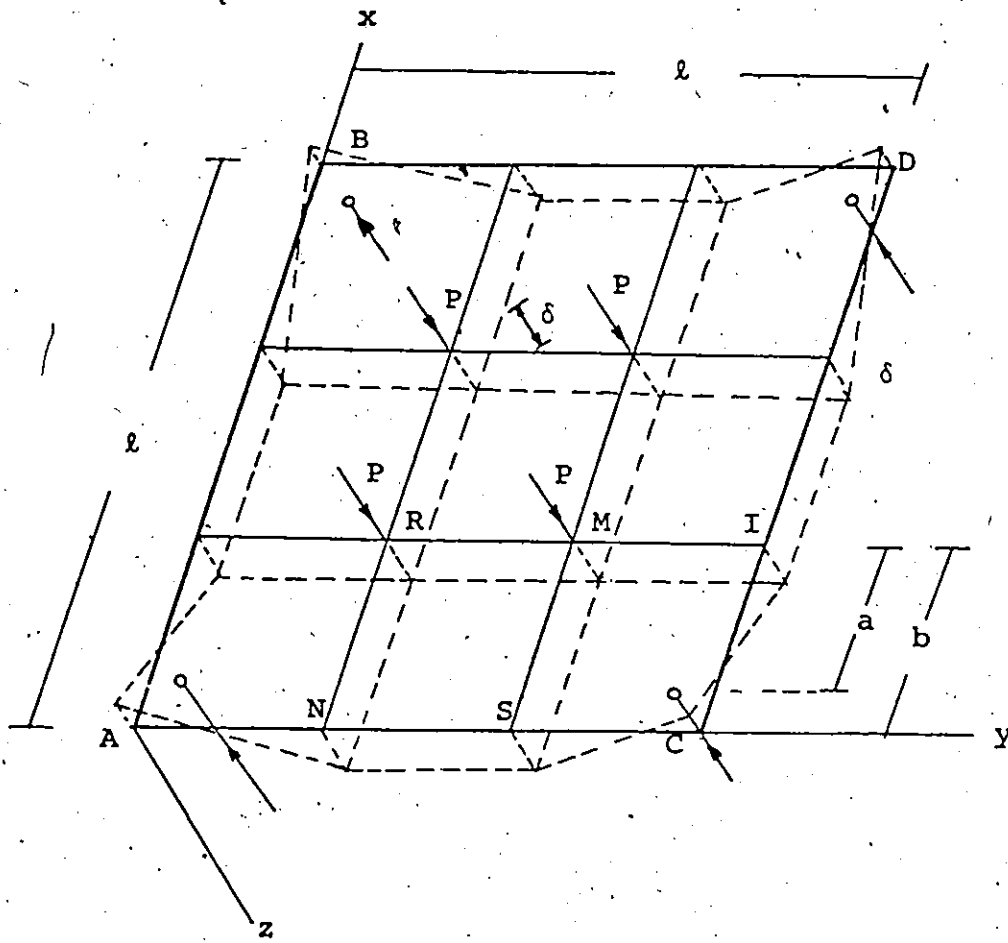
COLLAPSE MODE ASSUMED FOR TEST TRUSS TYPE ONE (MODEL 1)
